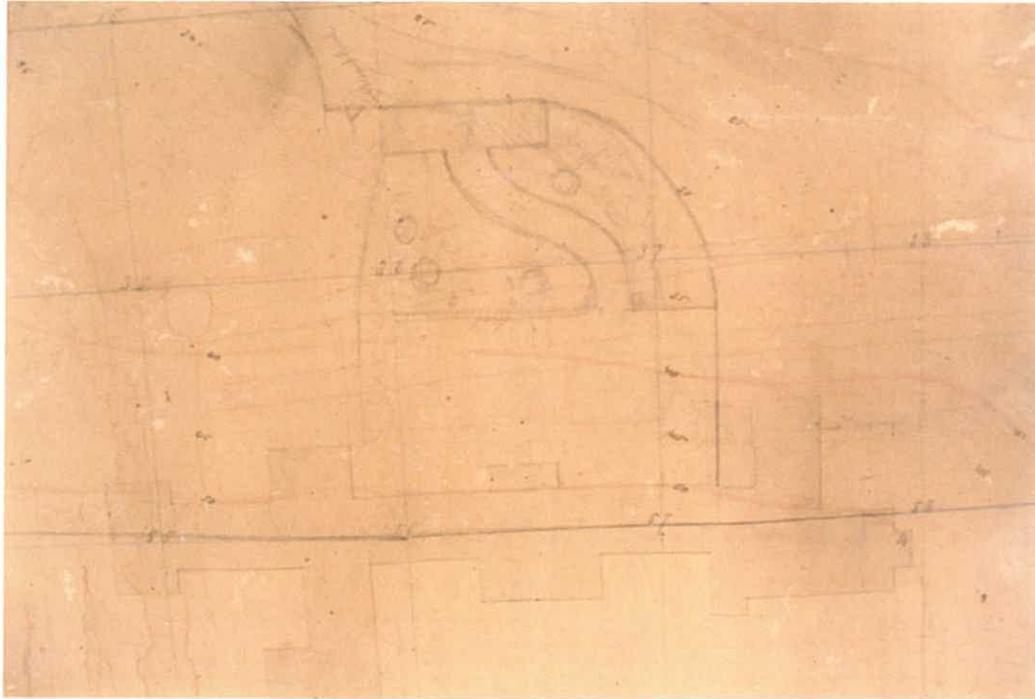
1867 Backus site plan, showing Wing G and penciled in landscaping.
